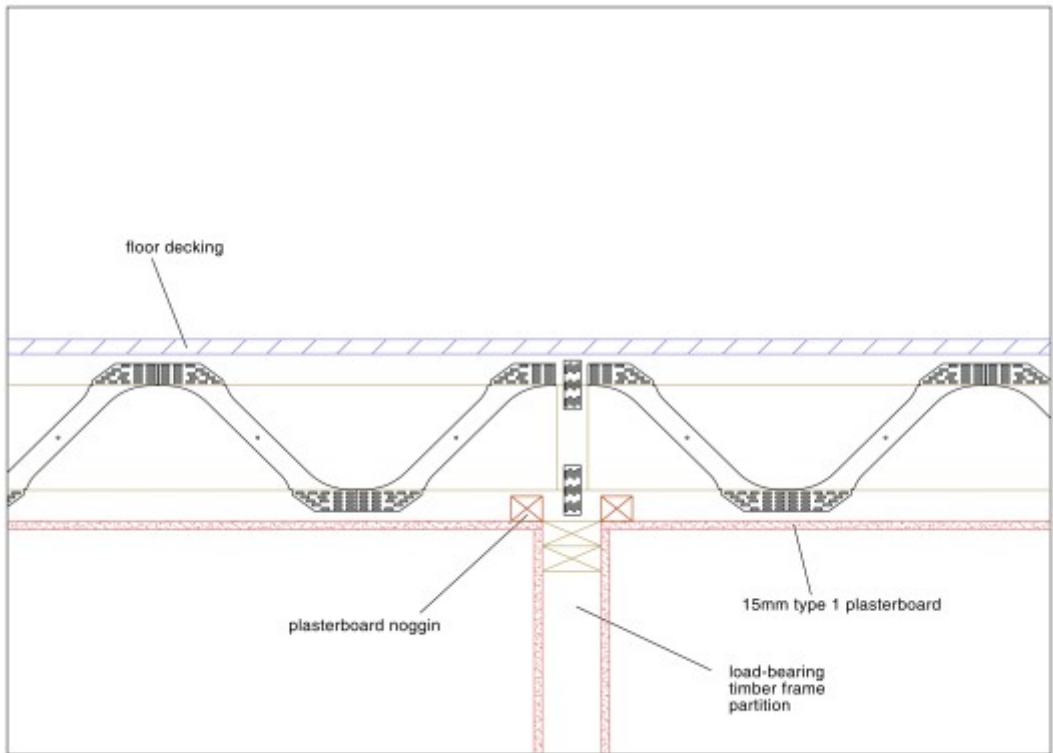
Cross section: load bearing timber frame wall perpendicular to joists; 30 minutes fire resistance; joist centres > 400mm
